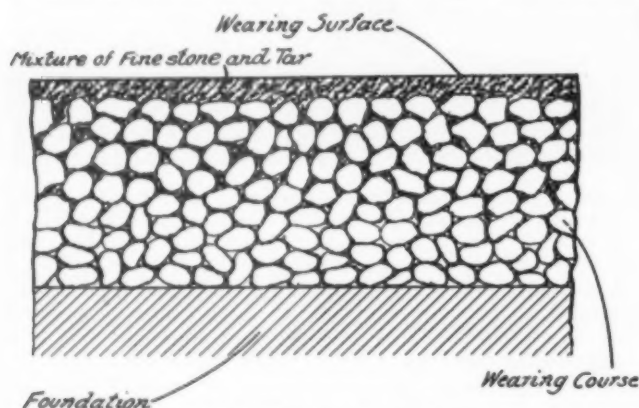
Method of F. S. Fleckenstein for Pavement Construction
